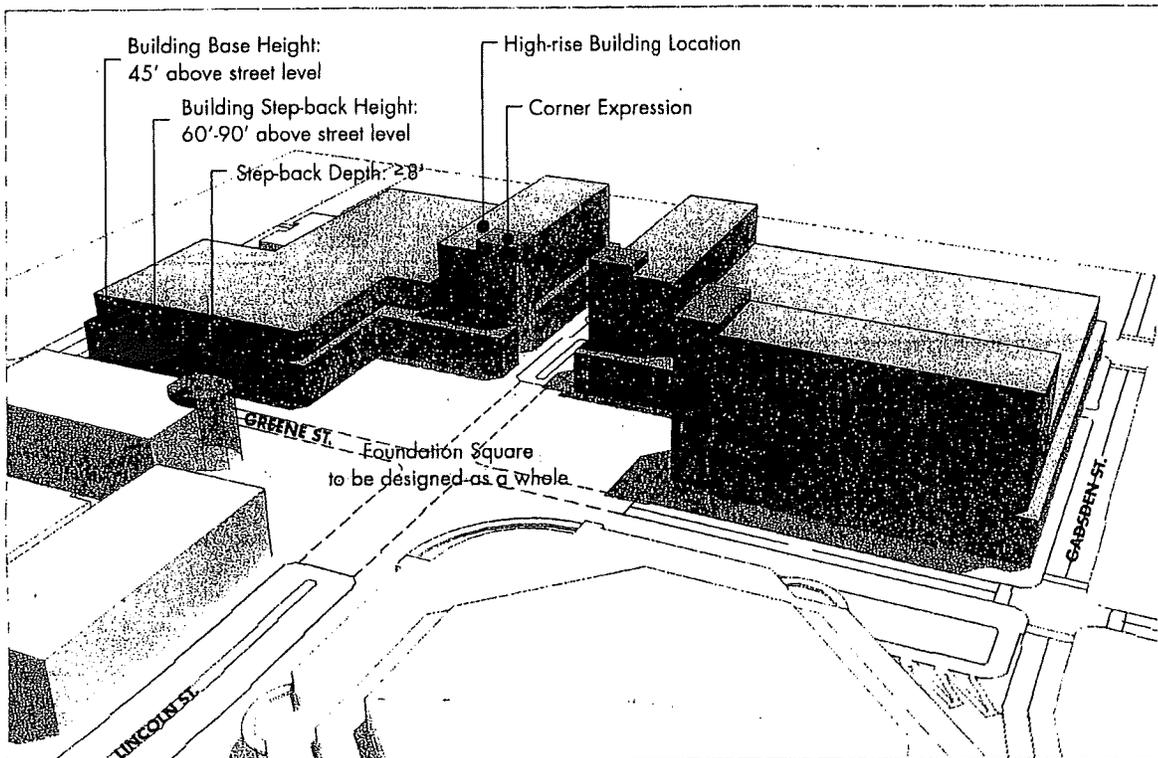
FOUNDATION SQUARE BUILDING ENVELOPE
